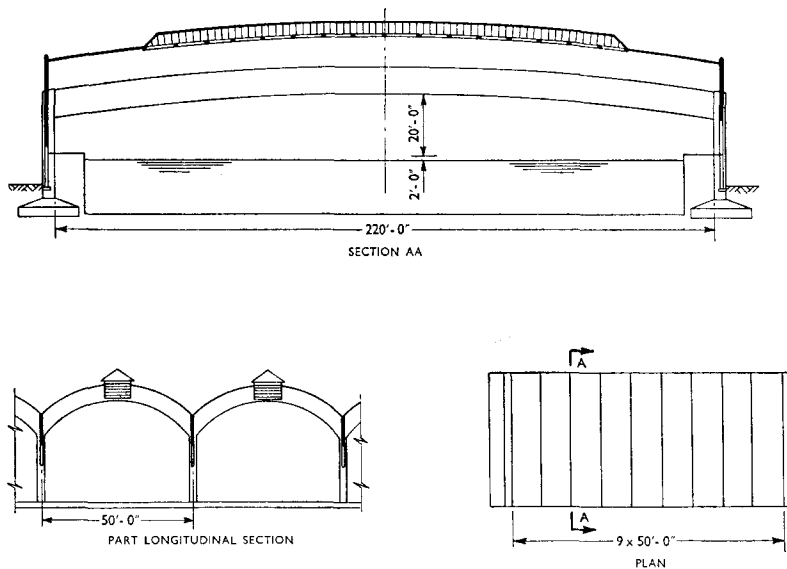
SCHEME FOR CONCRETE SHELL ROOF WITH PRESTRESSED EDGE BEAMS
